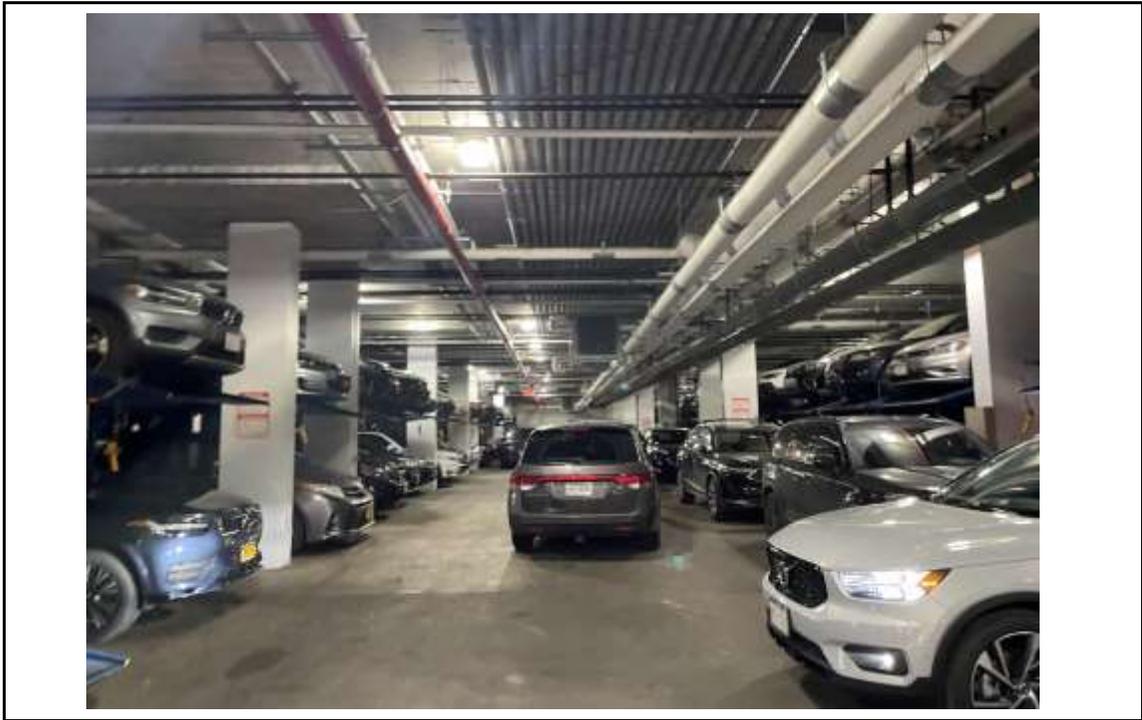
Subgrade parking garage concrete slab, facing southeast. 02 March 2023.
